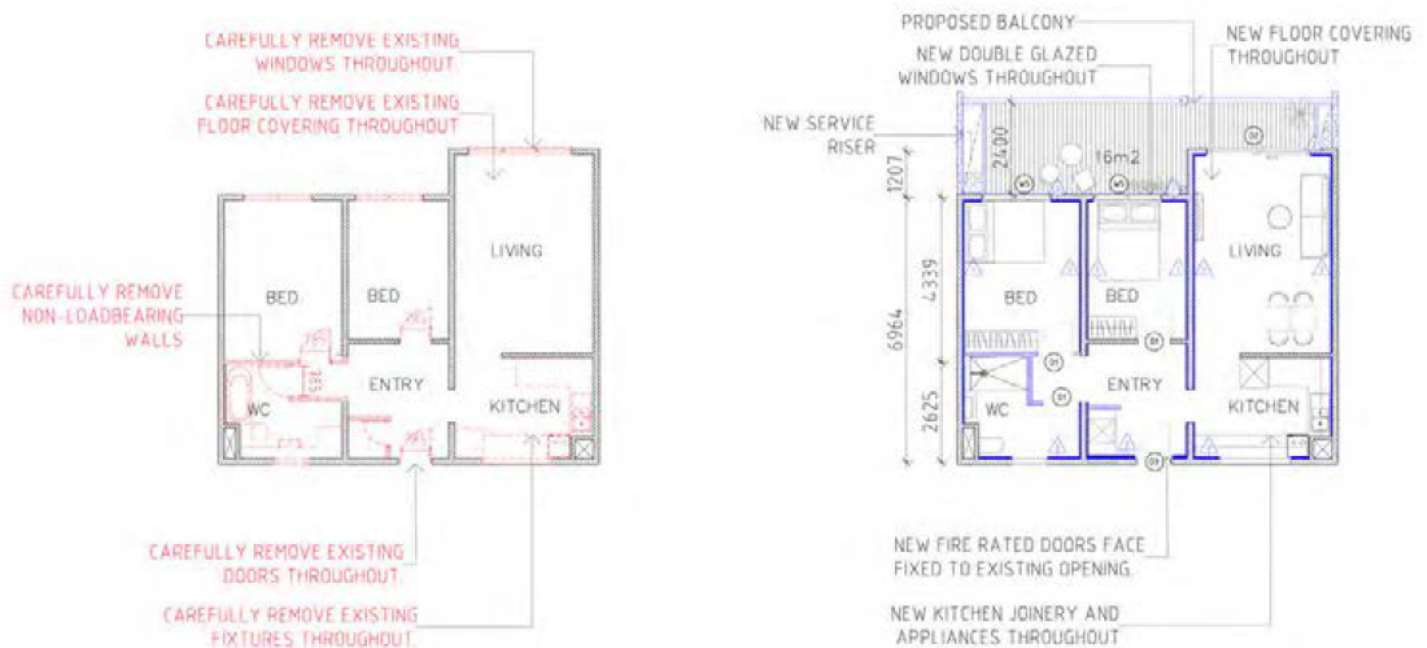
Demolition and proposed plan for flat Type A. OFFICE
